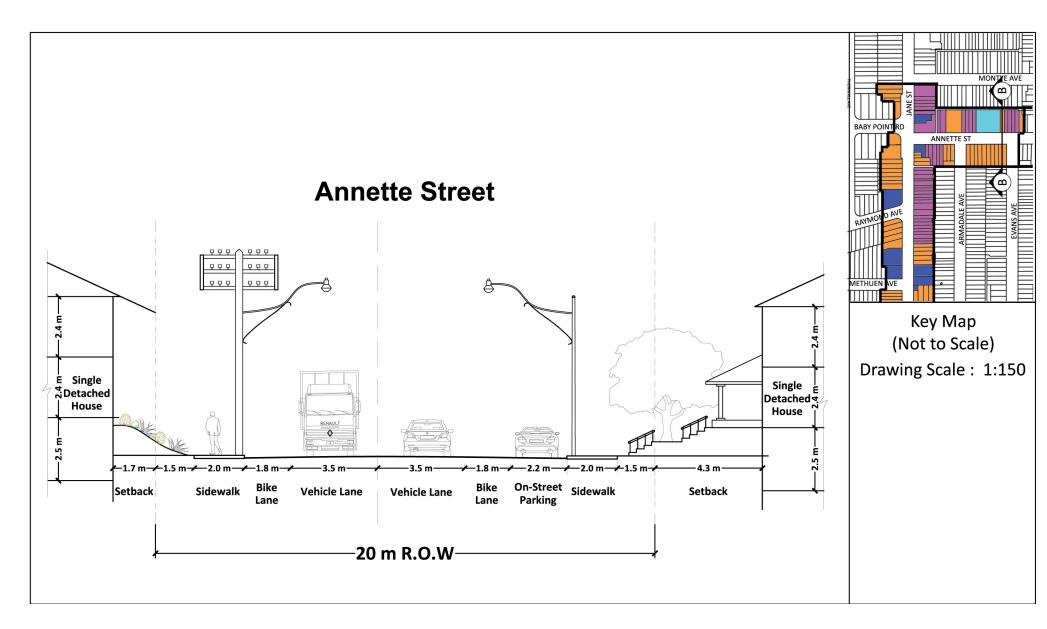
Annette Street Cross-section B (Residential on both sides)
